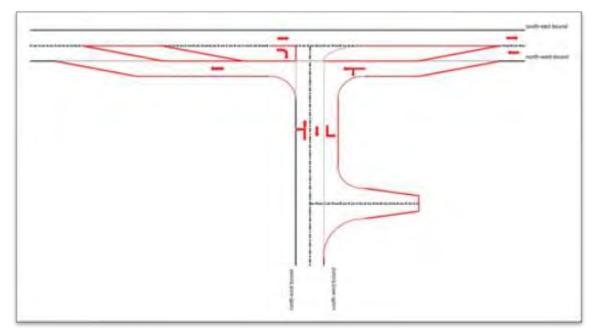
Line Diagram: Proposed R31 Intersection Layout
